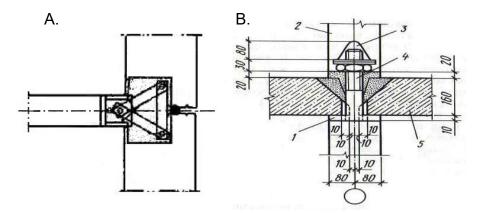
A. Bolted connection of the walls with the plate; B. Bolted connection of the walls (12)
